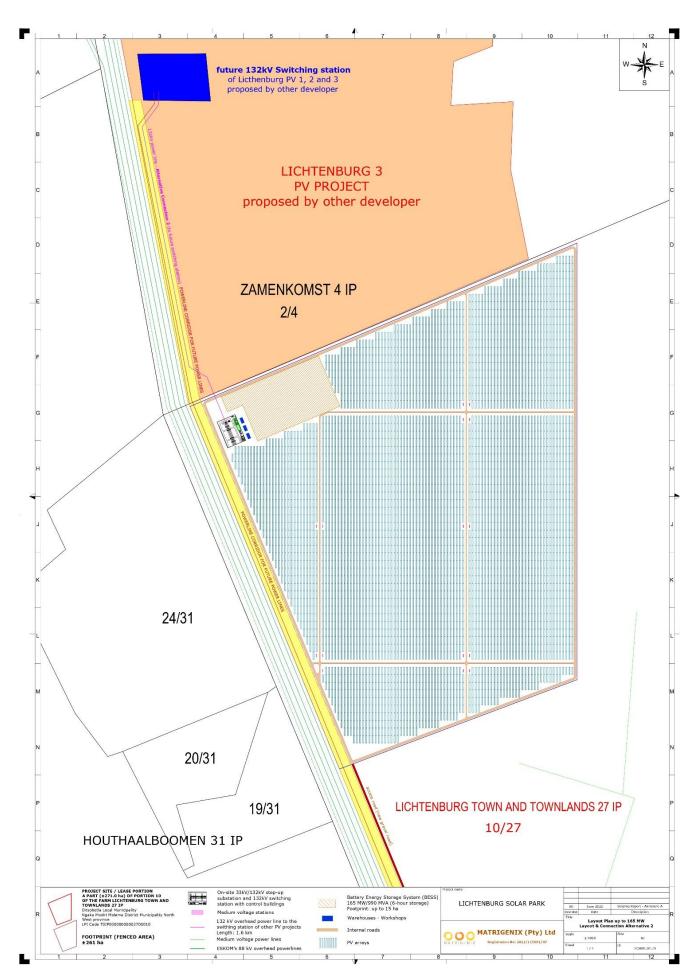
Proposed Draft Layout Plan of the Lichtenburg Solar Park – Alternative 2
